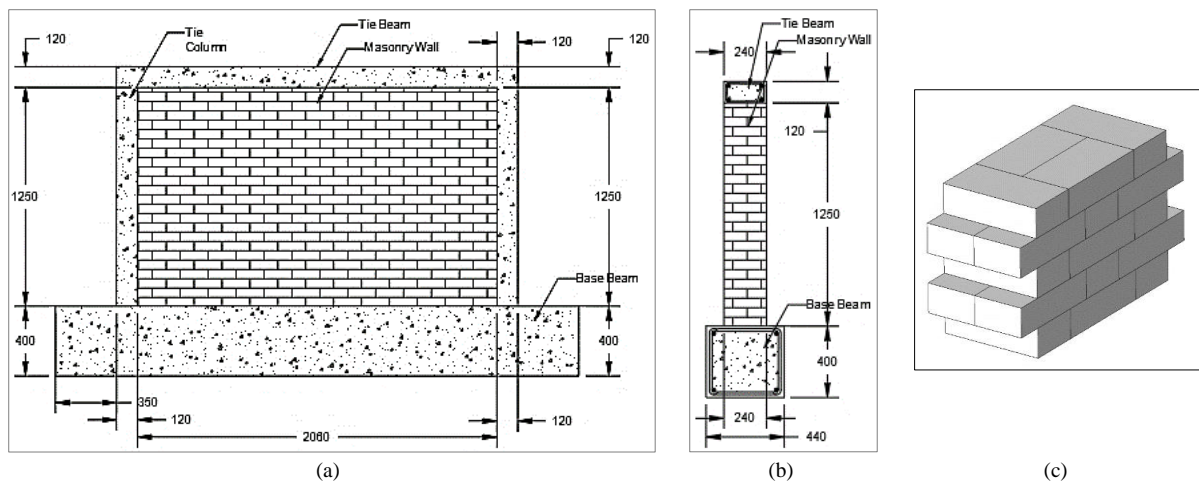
(a), (b) Dimensions of the CM specimen [20], and (c) Flemish brick bond (unit in mm)
